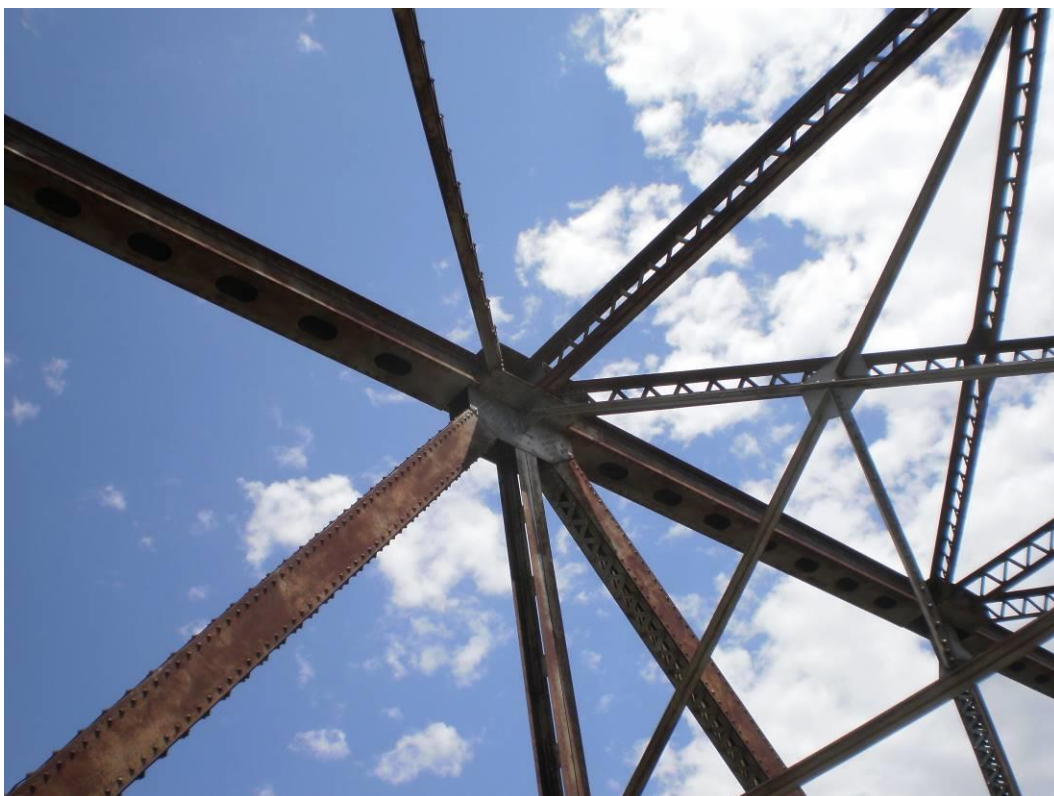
Slightly Better Coating Condition above the Splash Zone
